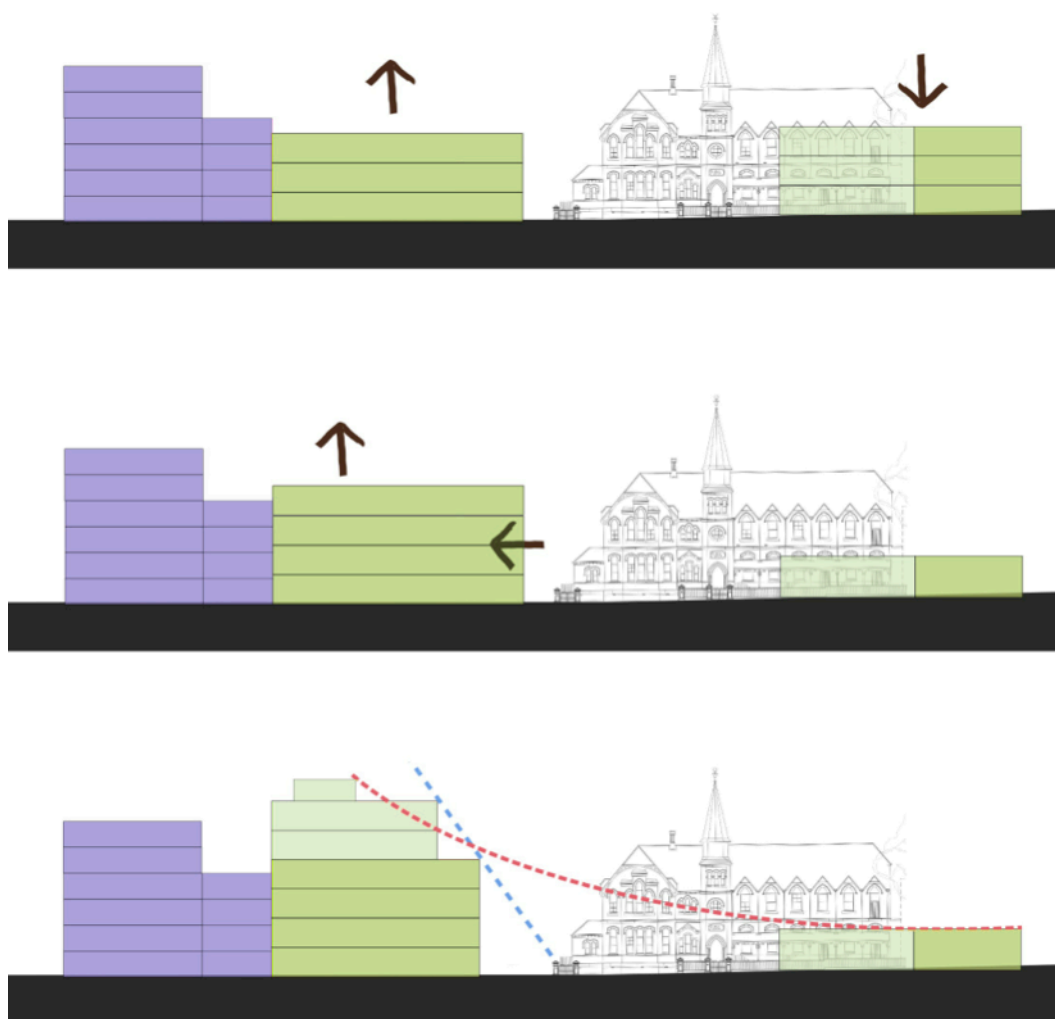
Massing Diagram (Buckland Street Elevation, not to scale).
